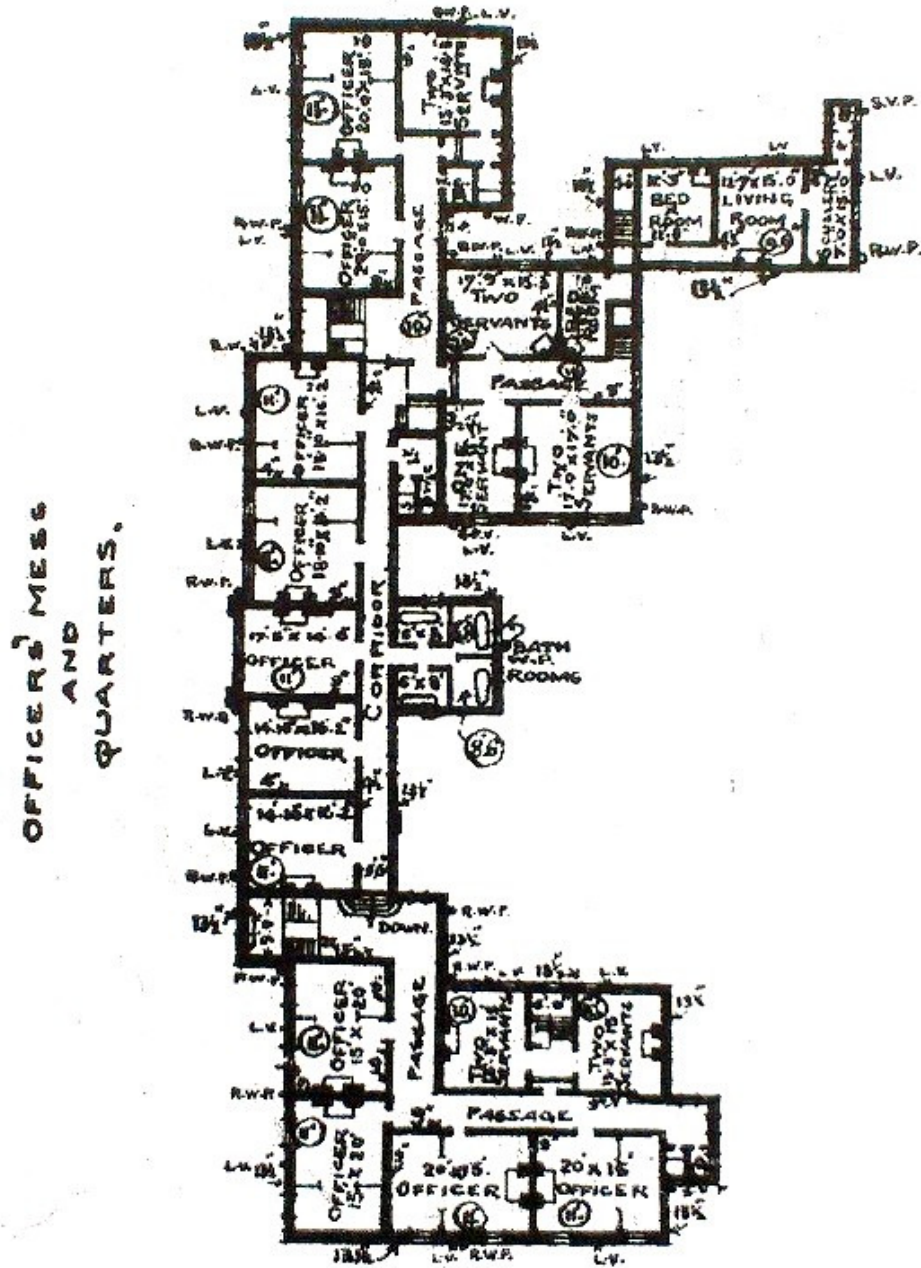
Extract from 1911 plan showing the original function and layout of the first floor of HYD 08 (EHA 95/1580).
